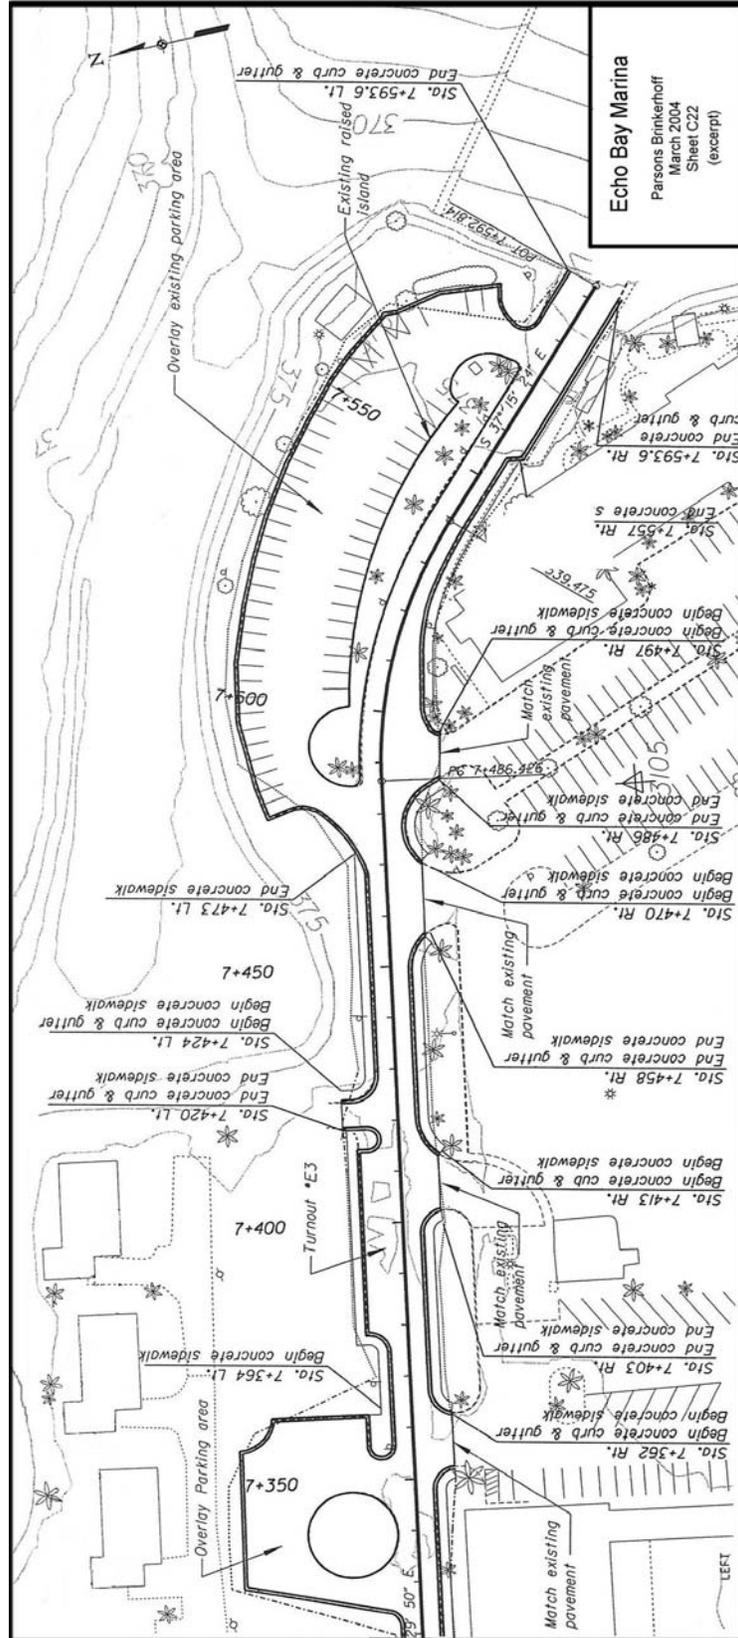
CONSTRUCTION SKETCH OF PROPOSED ECHO BAY MARINA IMPROVEMENTS
